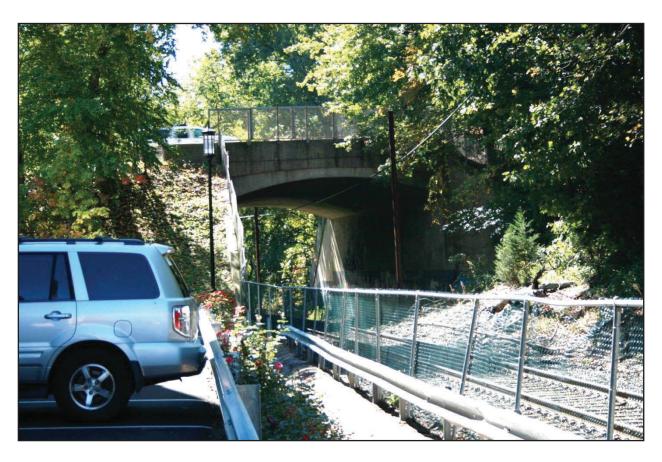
Merritt Parkway Main Avenue Bridge (Bridge Nos. 530A and 530B), north elevation, camera facing southwest.
